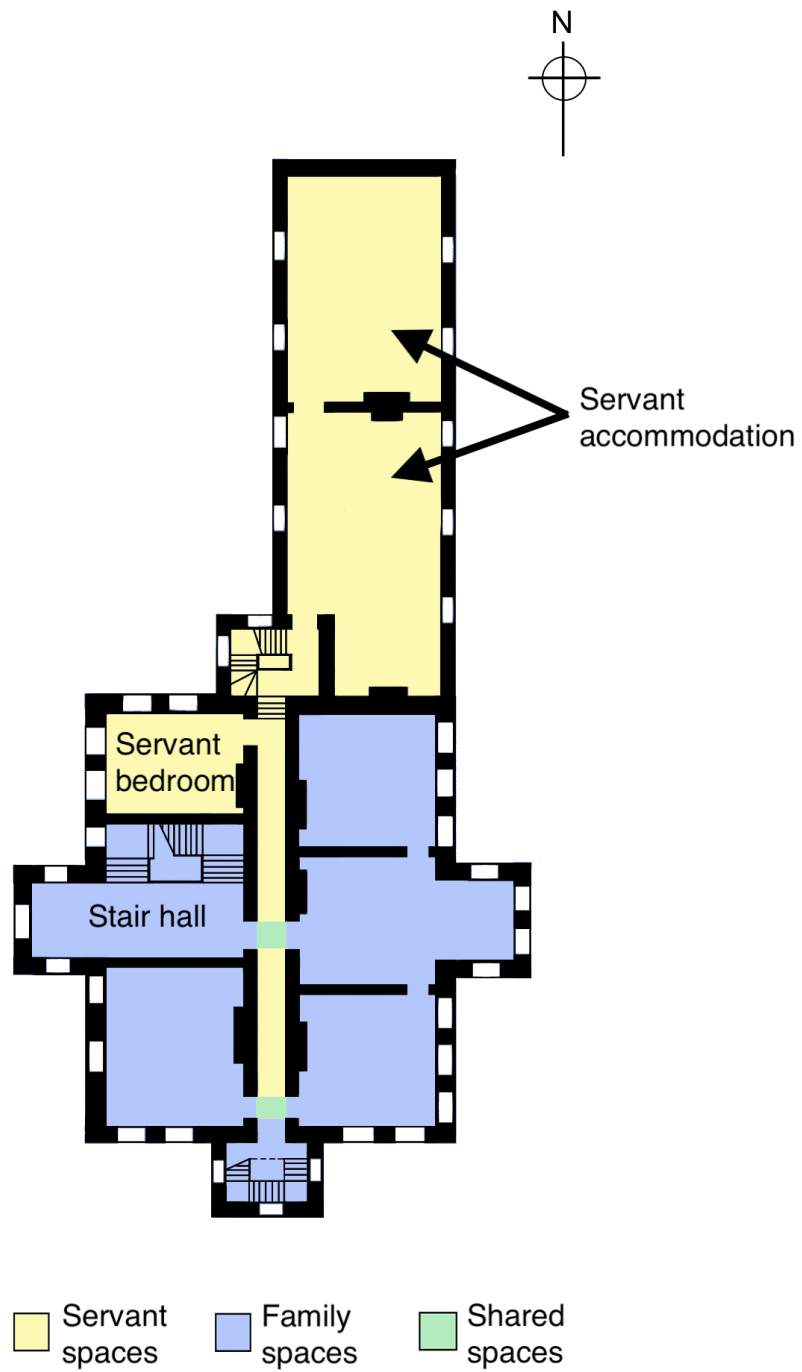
Kiplin Hall c1740 Phase 1 first floor plan
